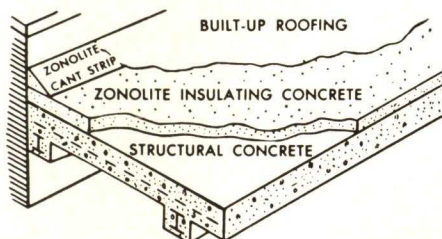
Zonolite Insulating Roof Fill over structural concrete.
